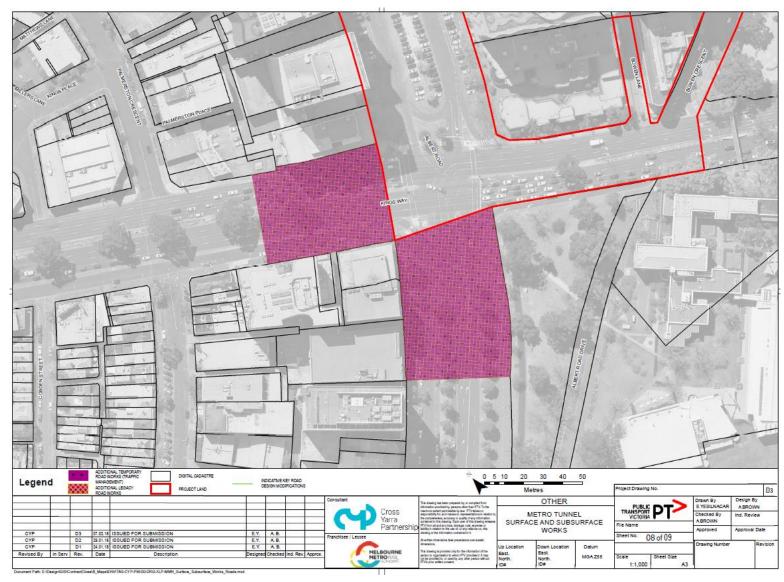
KINGS WAY AND ALBERT ROAD ADDITIONAL ROAD SURFACE WORKS
